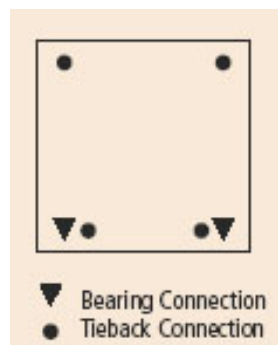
Typical connections arrangement (from Precast/Prestressed 2007, by permission).
